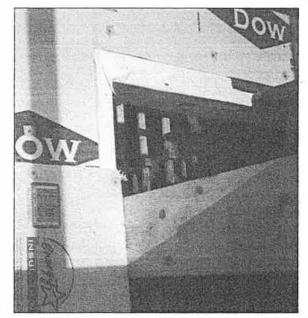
Insulation detail at rough window opening. The 1-inch thick Styrofoam (exposed top) butts up flush against the 1 x 1.5 inch furring strip that was nailed around the perimeter of the rough window opening. The half-inch Styrofoam (bottom) then laps over both. Voss says the detail provides a very tight assembly and gives the window installer a nice solid surface to screw into.
